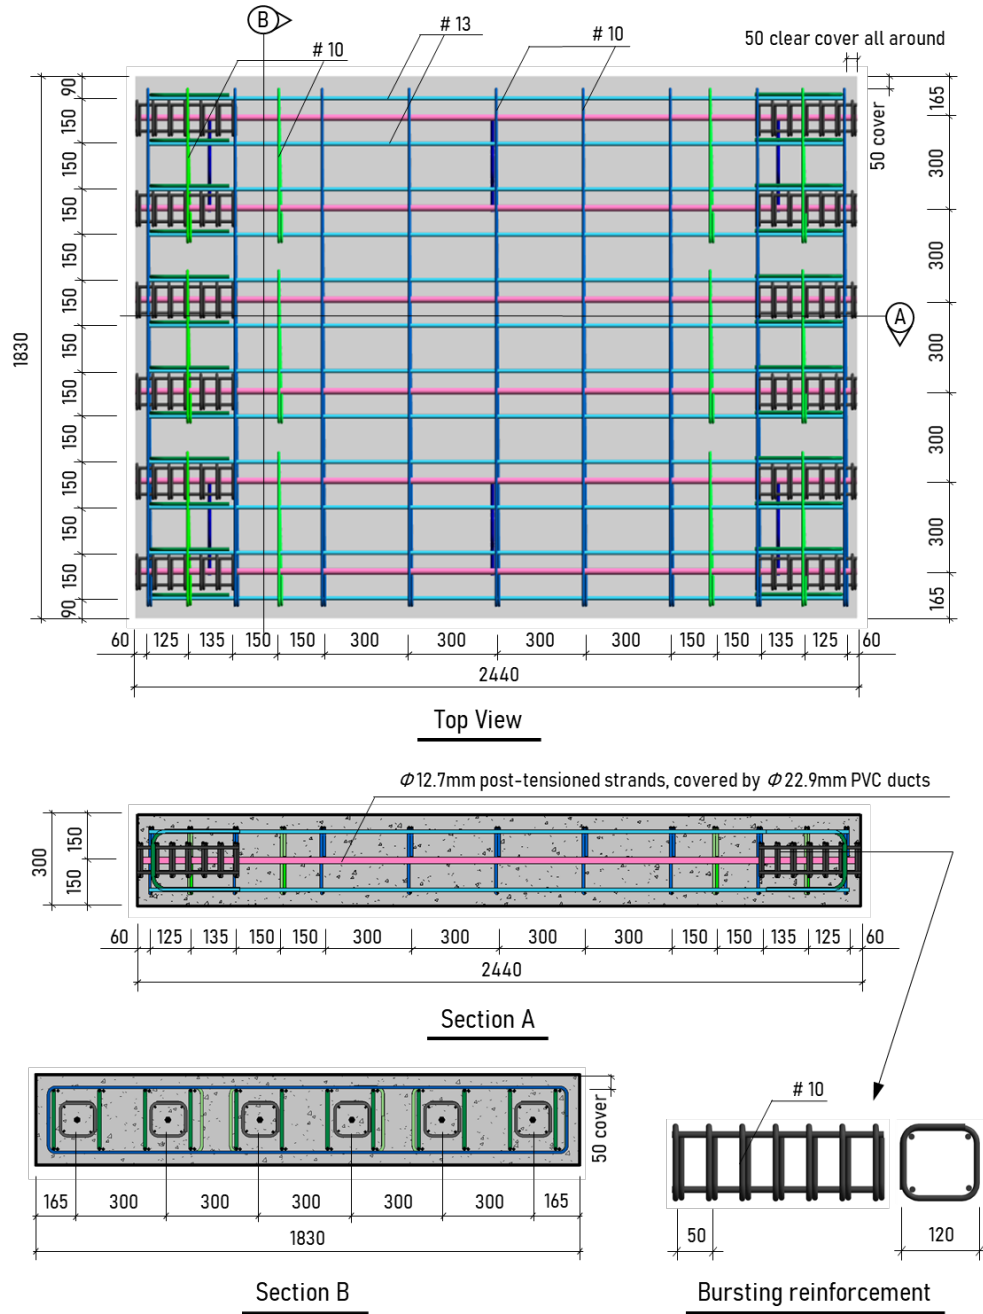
Reinforcement layout for TS 1,3 and 4
